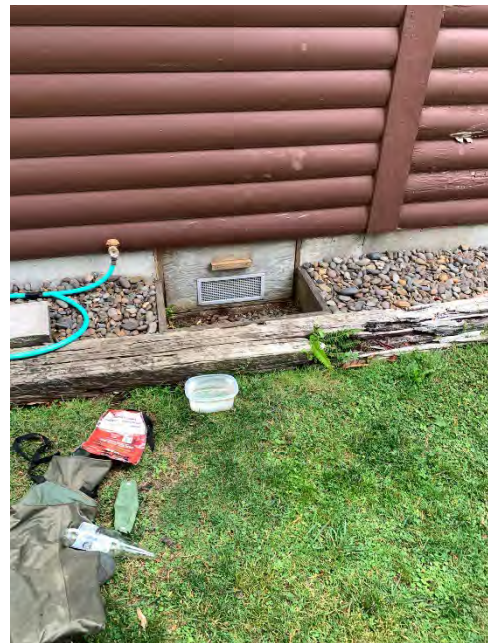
CRAWL SPACE DOOR UNLOCKED
